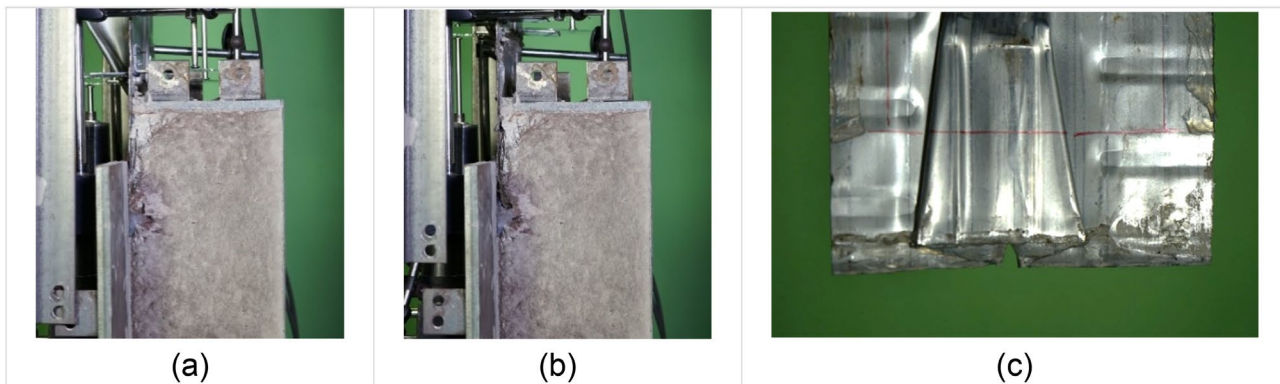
| Pull-out test conditions: (a) Concrete at maximum load, (b) concrete after test, (c) deck plate after test.
